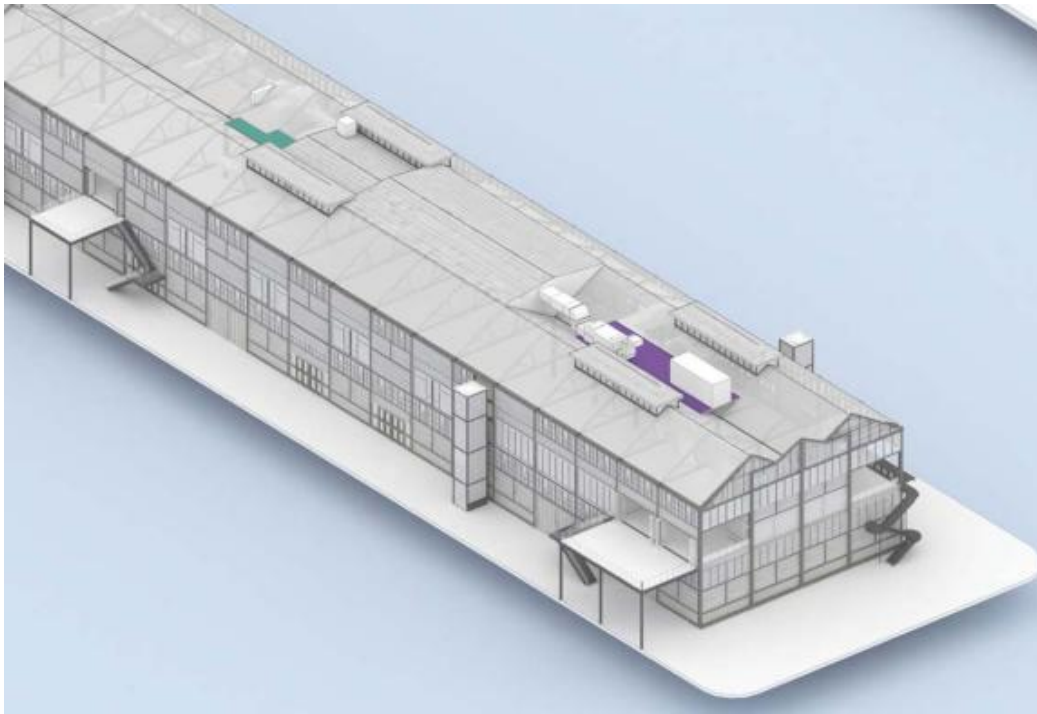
Piers 4/5 Roof services. Drawing from Hassell.
